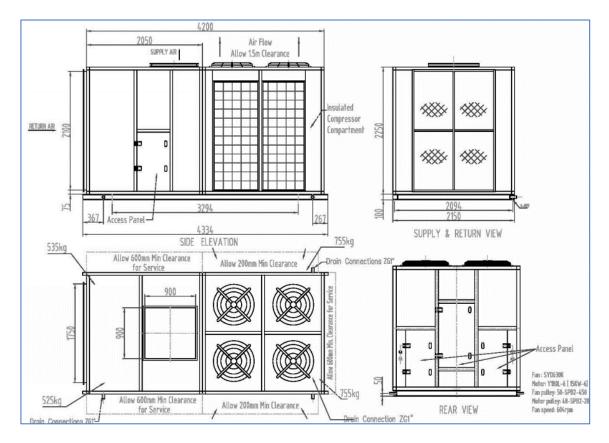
Package AHU Dimensions (Dunnair Australia 2015)
